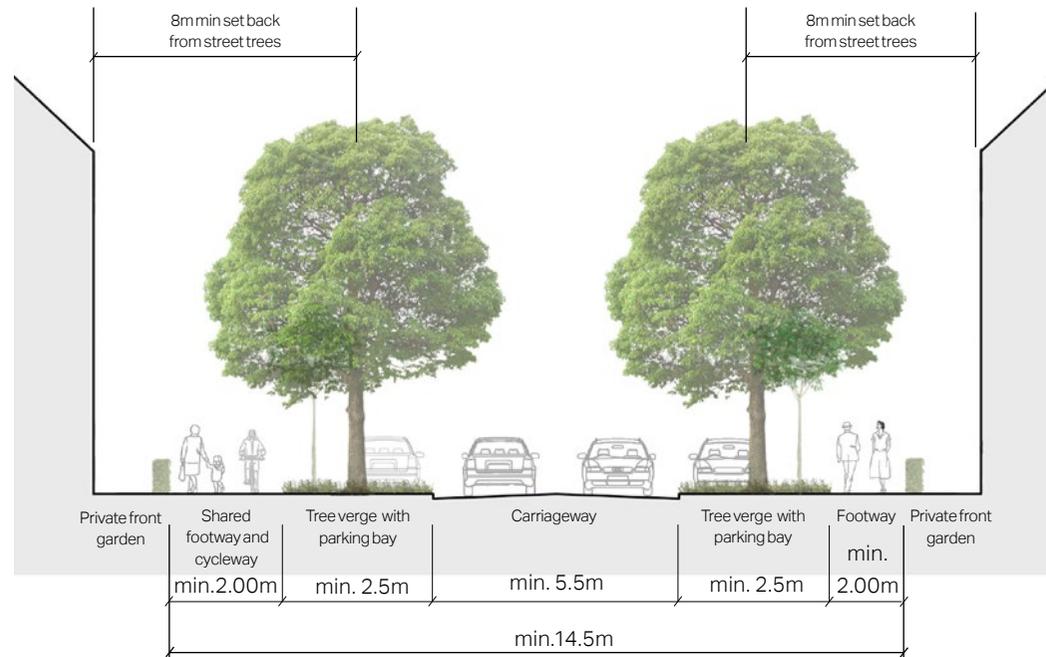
Cross-section to illustrate some dimensions for primary streets.
